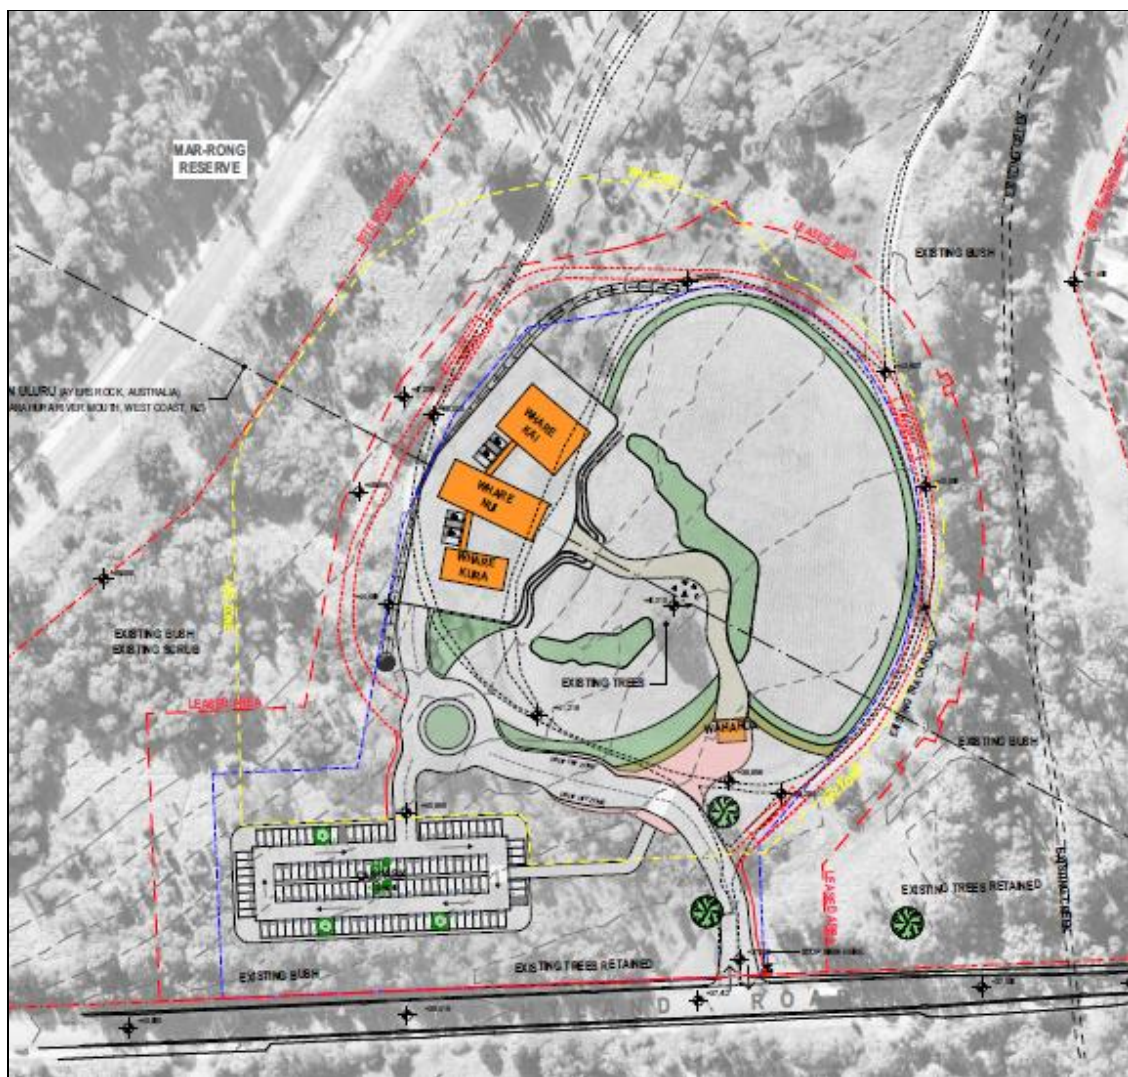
Proposed site plan. Source: DKO Architecture (NSW) Pty Ltd
